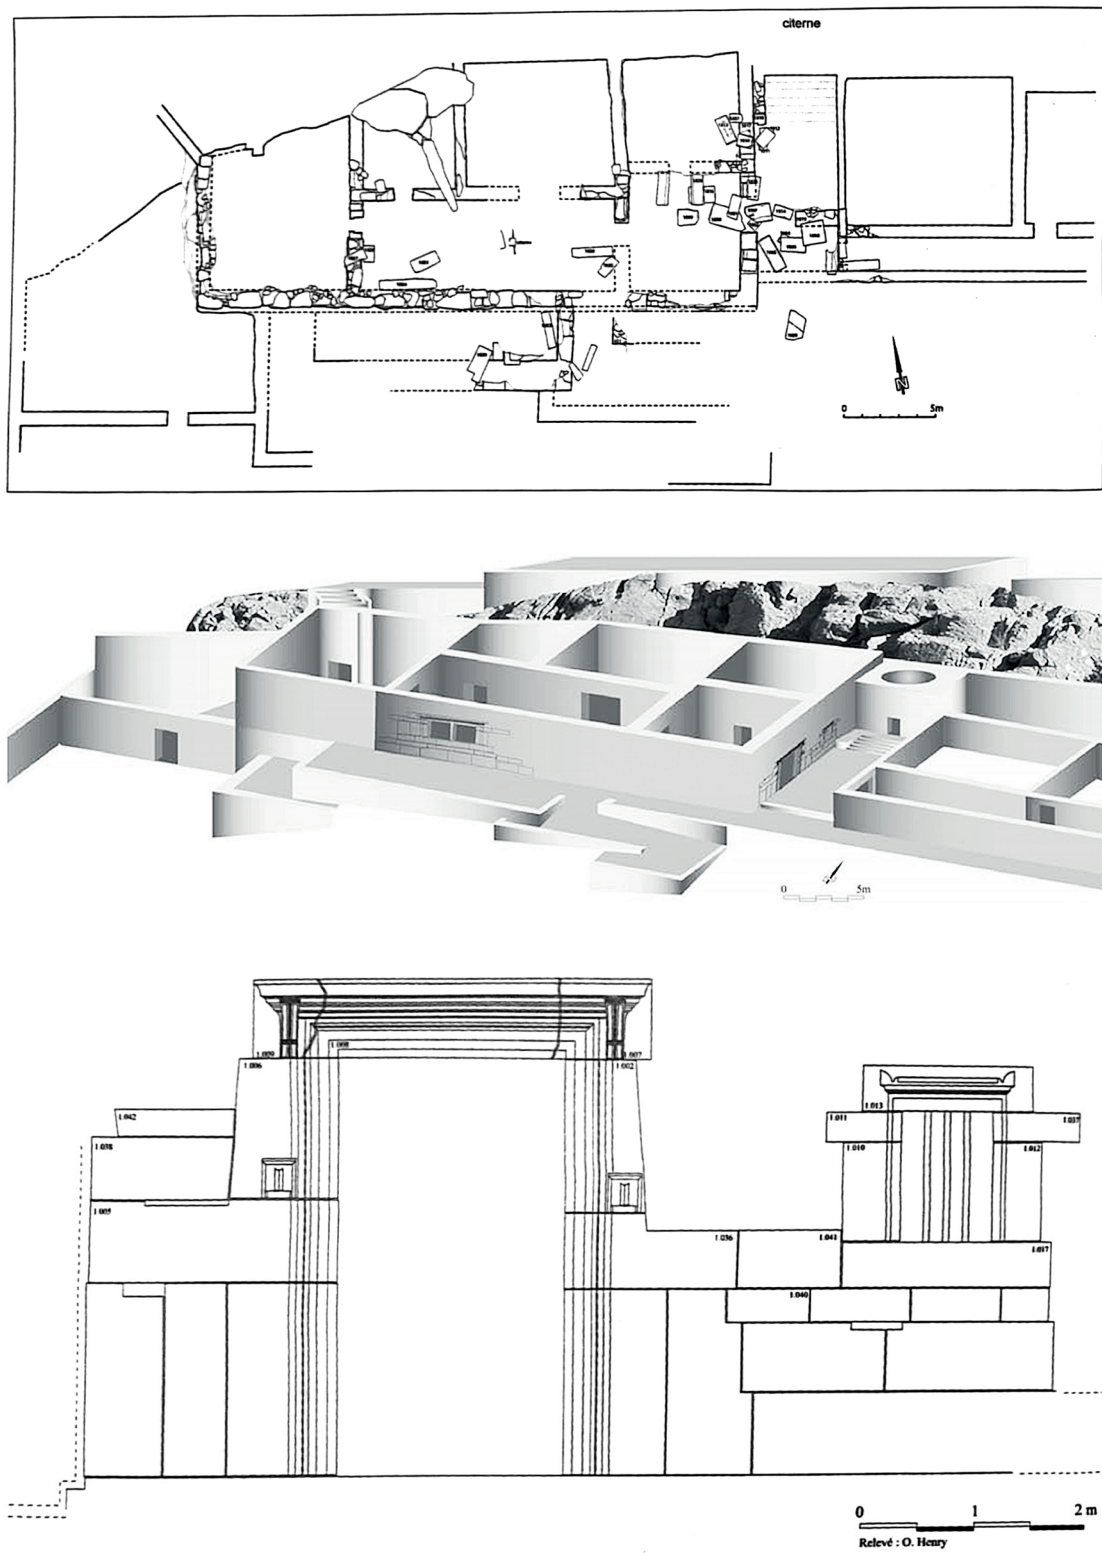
Plan, 3D Rendering and Facade of Principia (Drawing: Beydağları Survey Archive, O. Henry).
